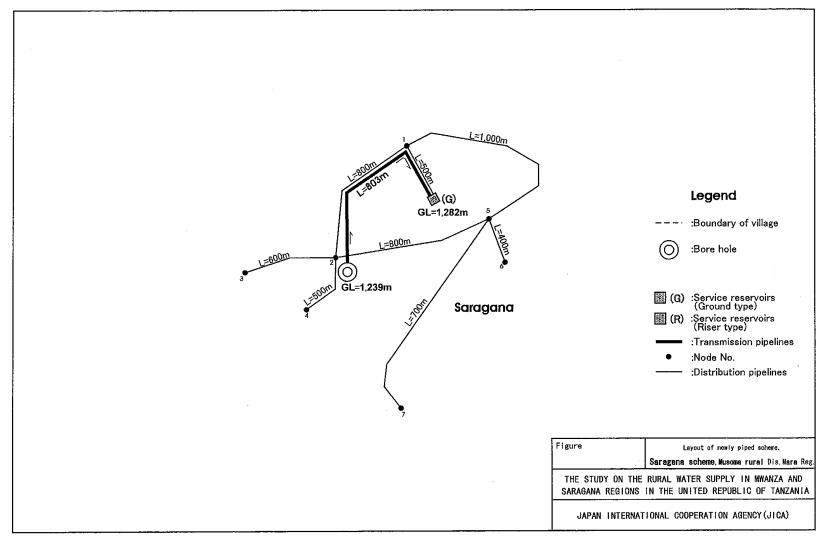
Layout of Newly Installed Piped Scheme (Saragana Scheme)
